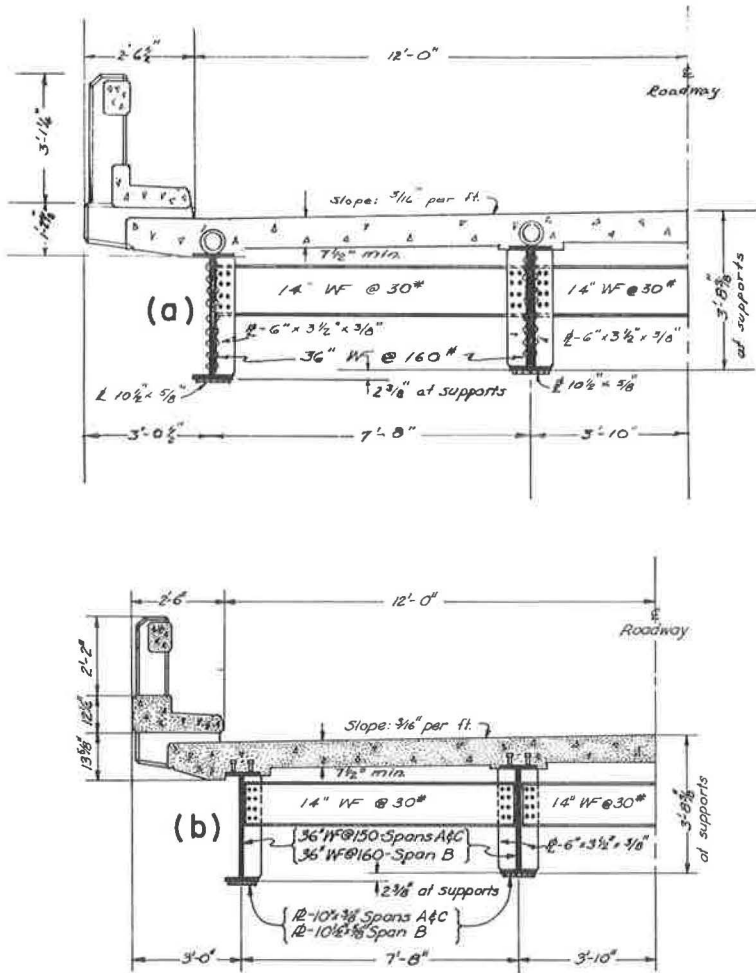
Half-transverse section of virtually identical 66-ft 5-in. spans B: (a) Weyer's Cave Bridge; and (b) Hazel River Bridge.
